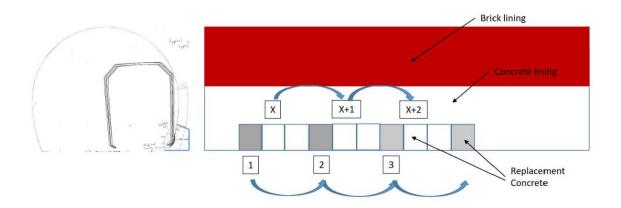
Example construction sequence for concrete wall reconstruction, where required
